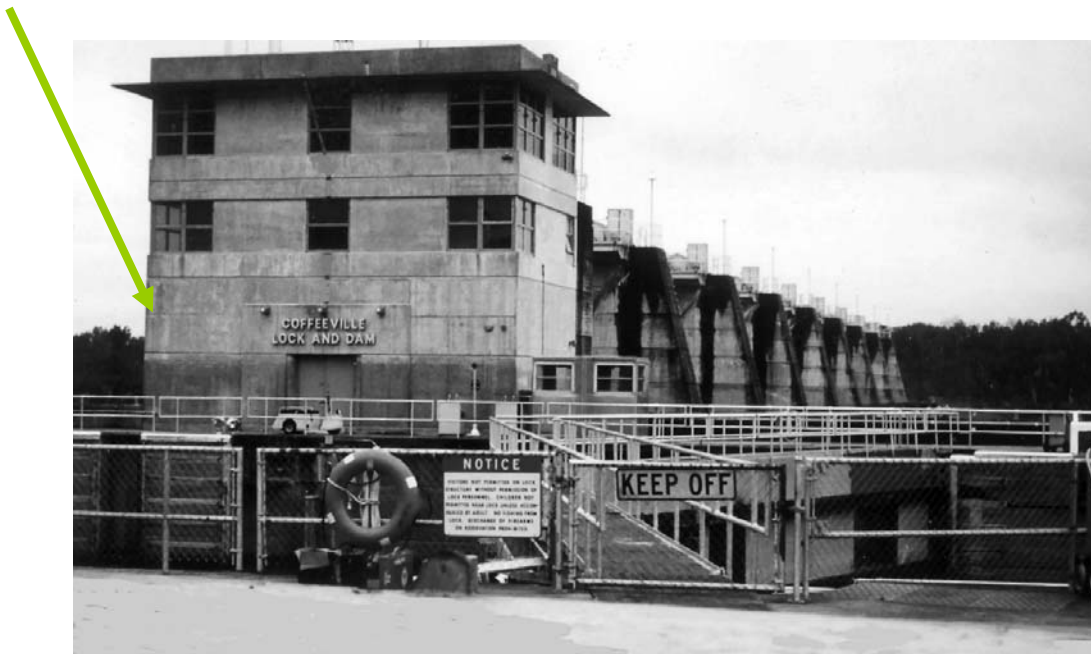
Photographs of station at Coffeetown Lock and Dam.
